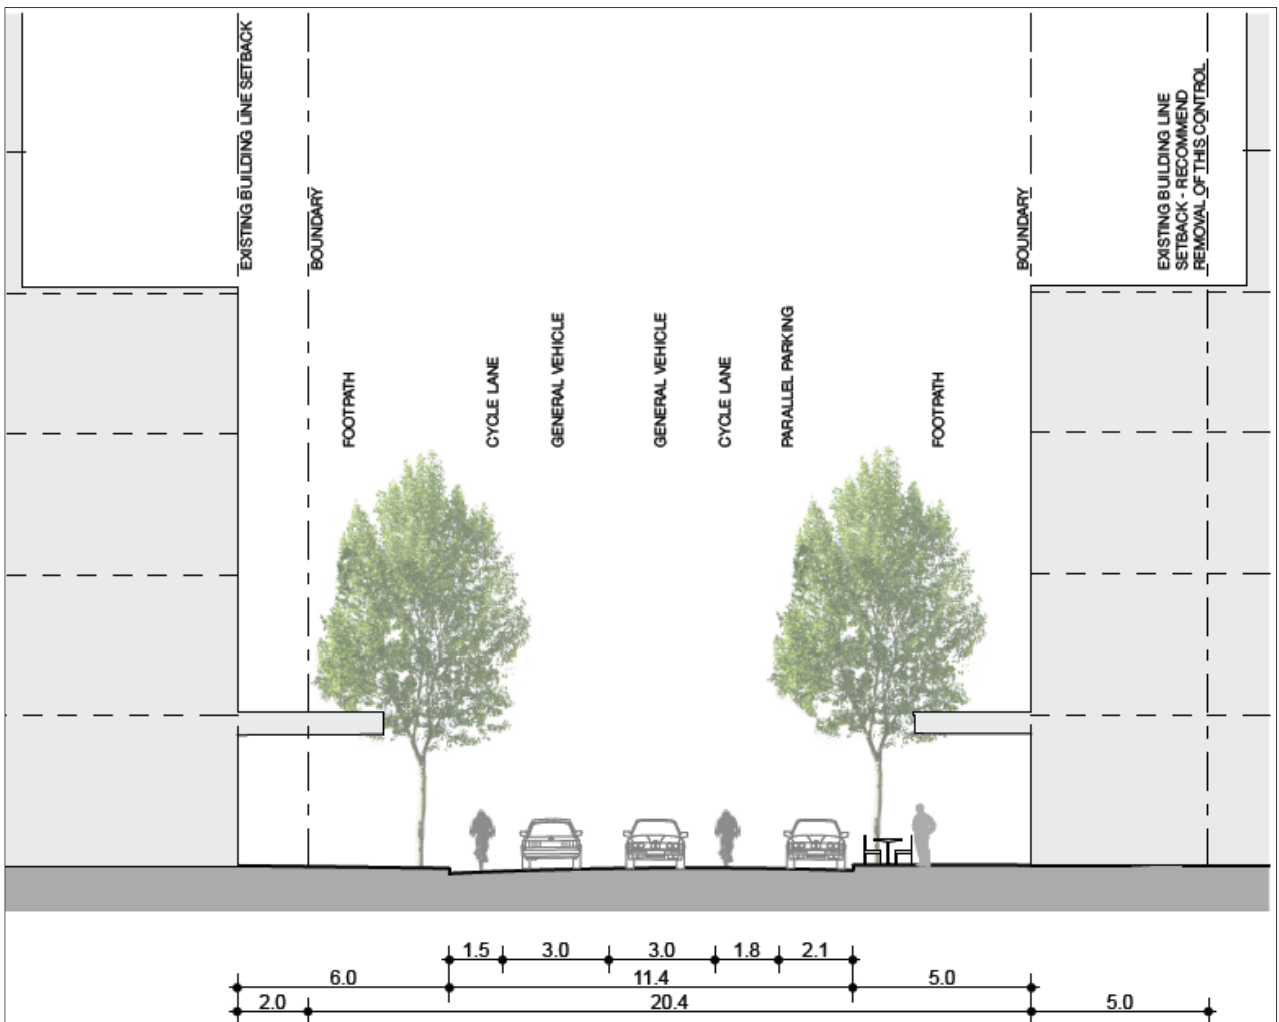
Proposed Anzac Street East Cross Section (Indicative) – Mid Block Looking East⁵⁰
